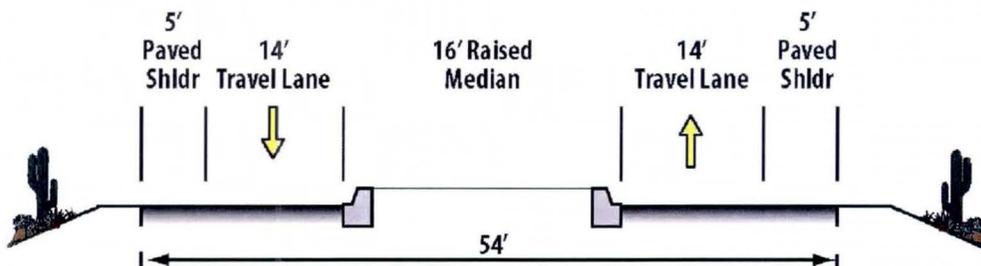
Interim Cross Section: Southern Avenue to Germann Road
